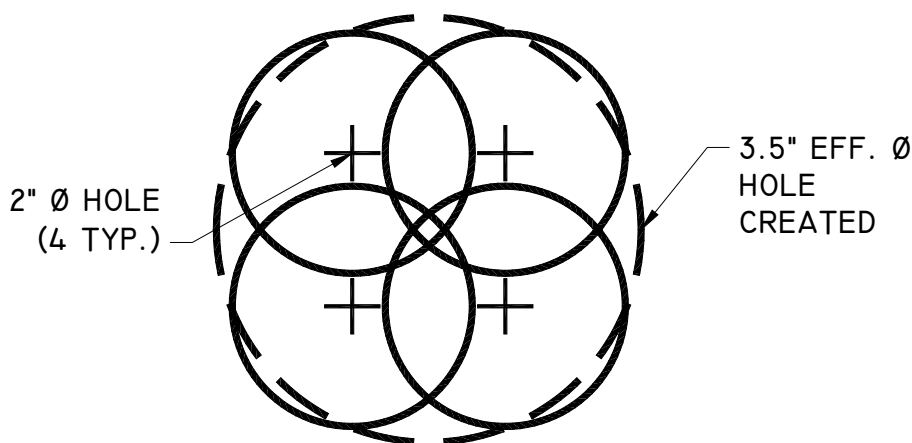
Method for drilling 3.5-in. hole with 2-in. rotary hammer drill bit for HTFAT connector
